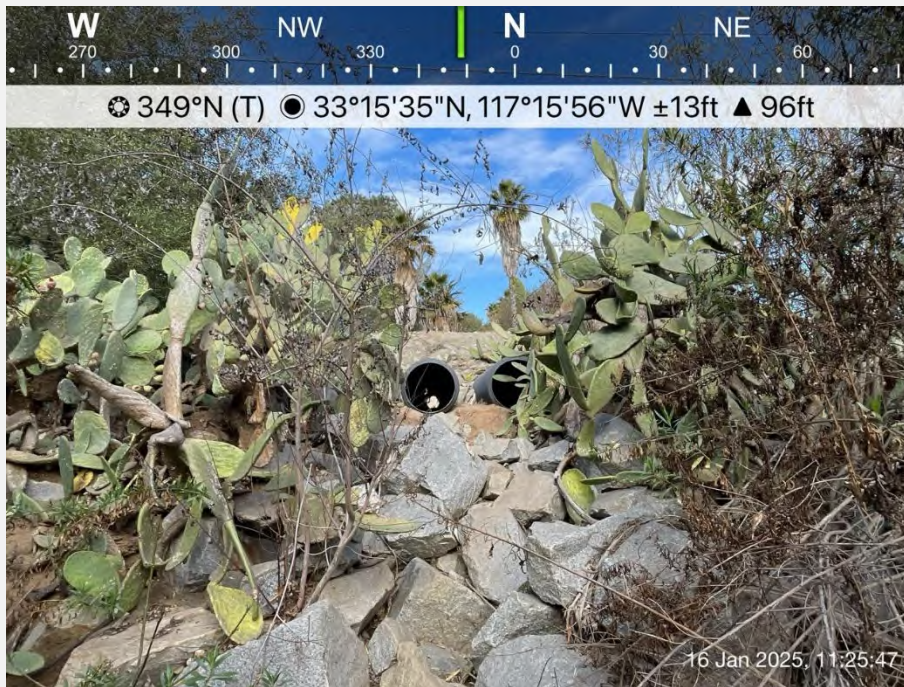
Agricultural habitat surrounding NWW-01. Photo facing northeast.
